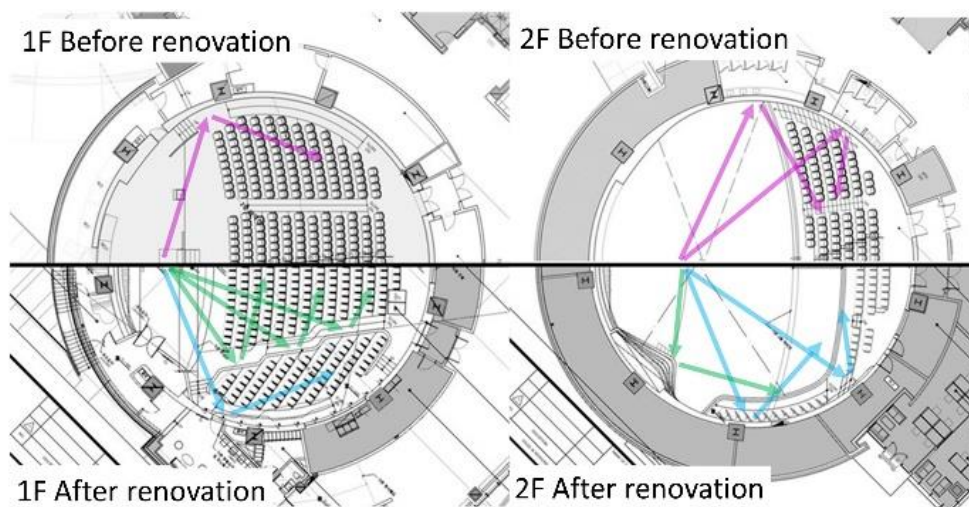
Floor plan of the evaluated space, depicting the existing design and the proposed improvements
